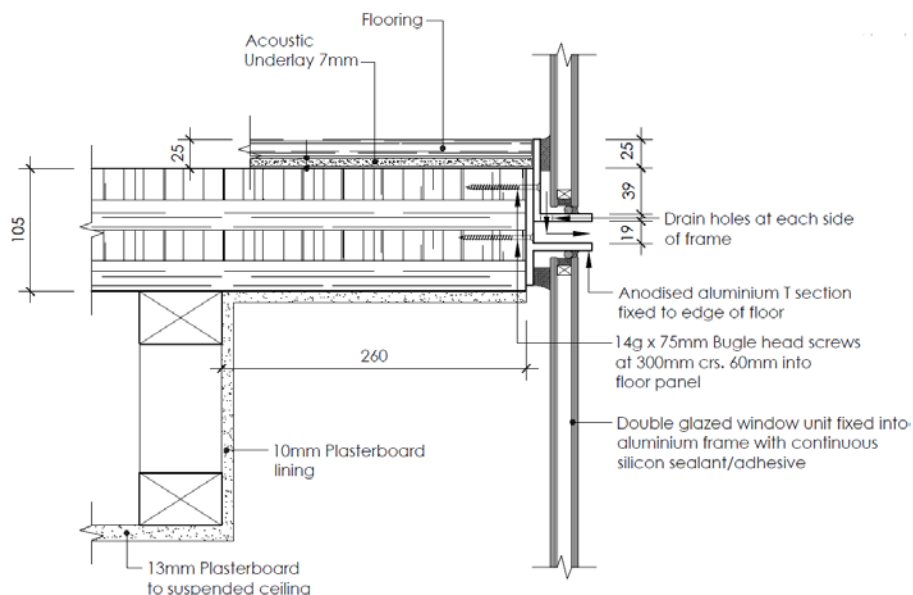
Head and sill detail of the original fixed glazing system (not to scale)
